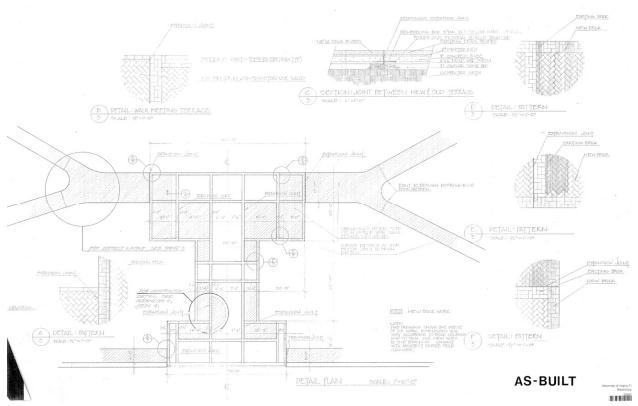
Record plan of the paving layout and details for the Rotunda Lower Forecourt project designed by J. Patrick Graham and constructed in 1976. (R-JAV-FMRC-FF-1976-07-26-65487_0p5-M-2-RotundaTerrAsBuiltPaving.jpg)
